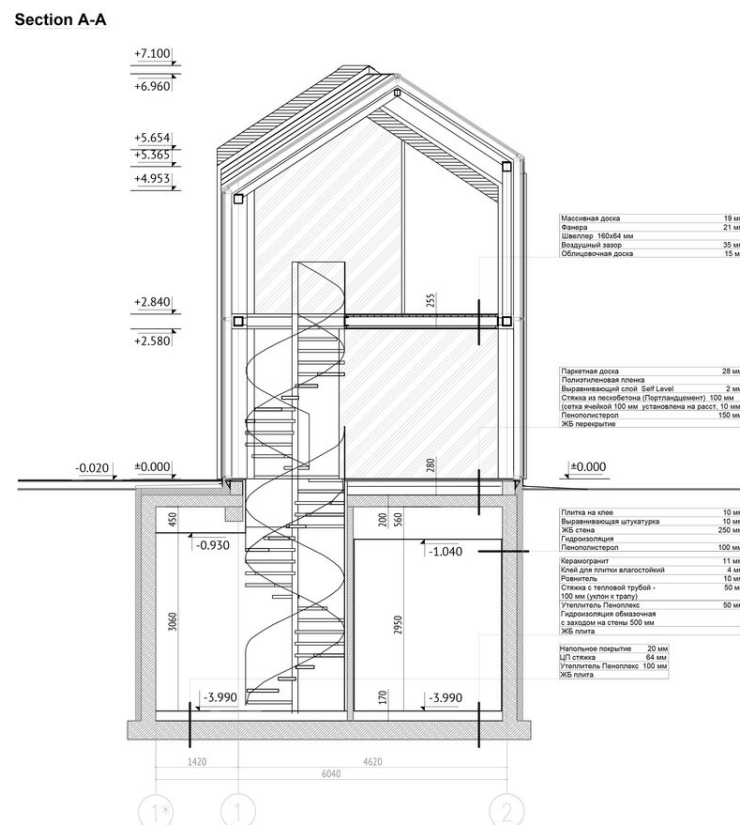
Section of Building(<https://www.archdaily.com/806618/the-sports-pavilion-horomystudio/58bc35afe58ece04510002e9-the-sports-pavilion-horomystudio-section-a-a>)
